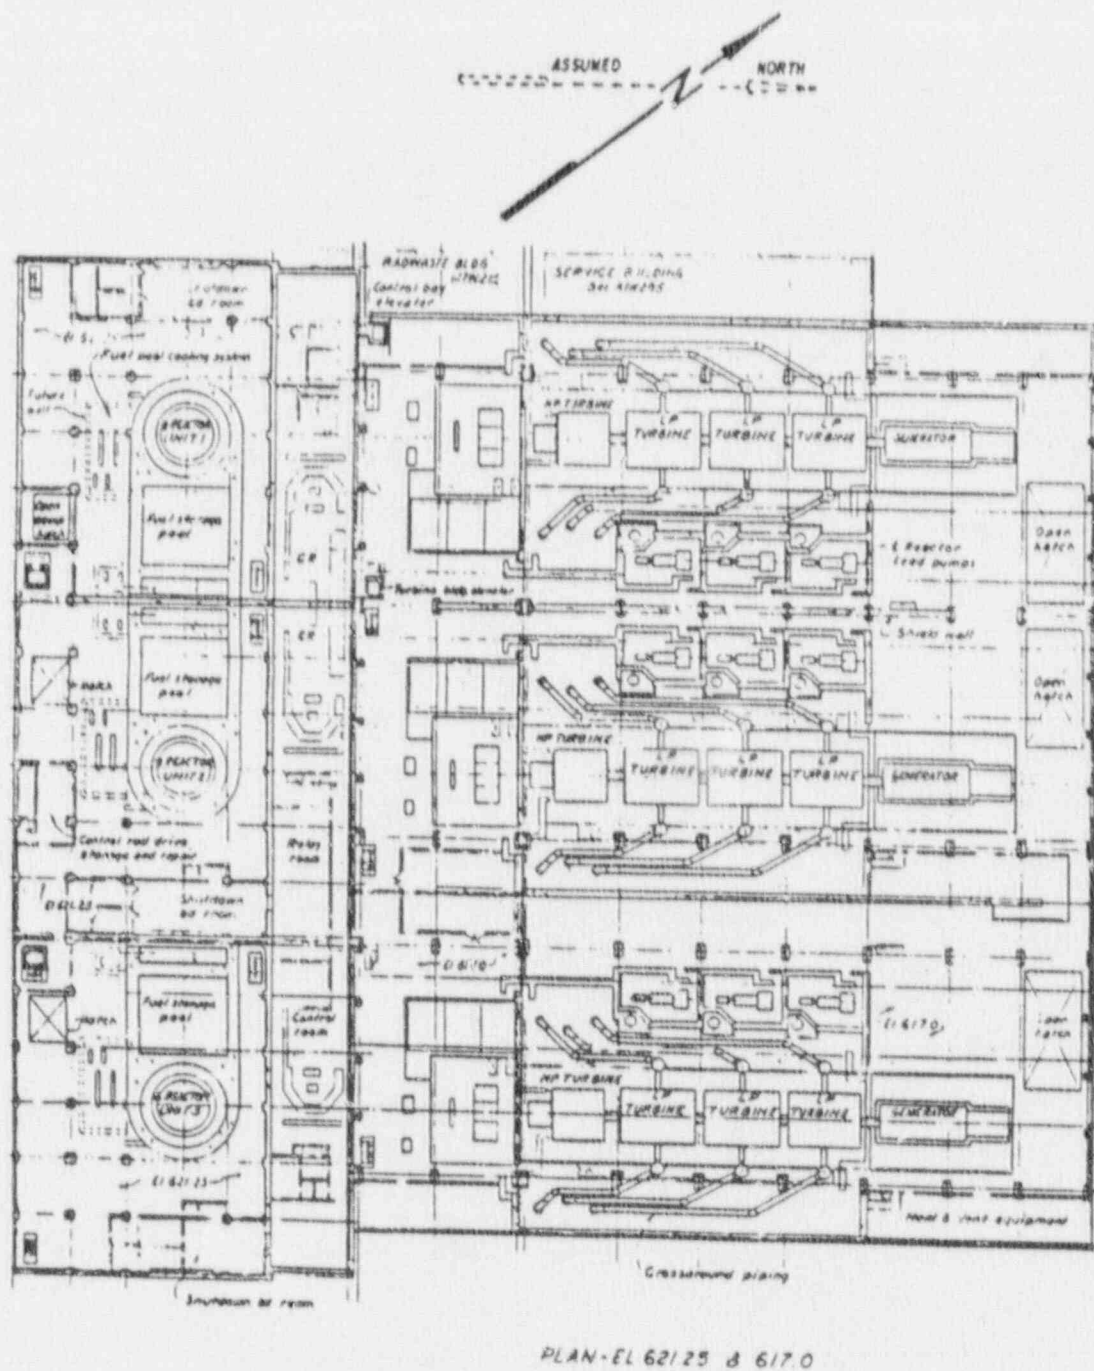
Overall Layout of the Browns Ferry Nuclear Plant, Elevations 617 ft. (Turbine Building) and 621.25 ft. (Reactor Building)
